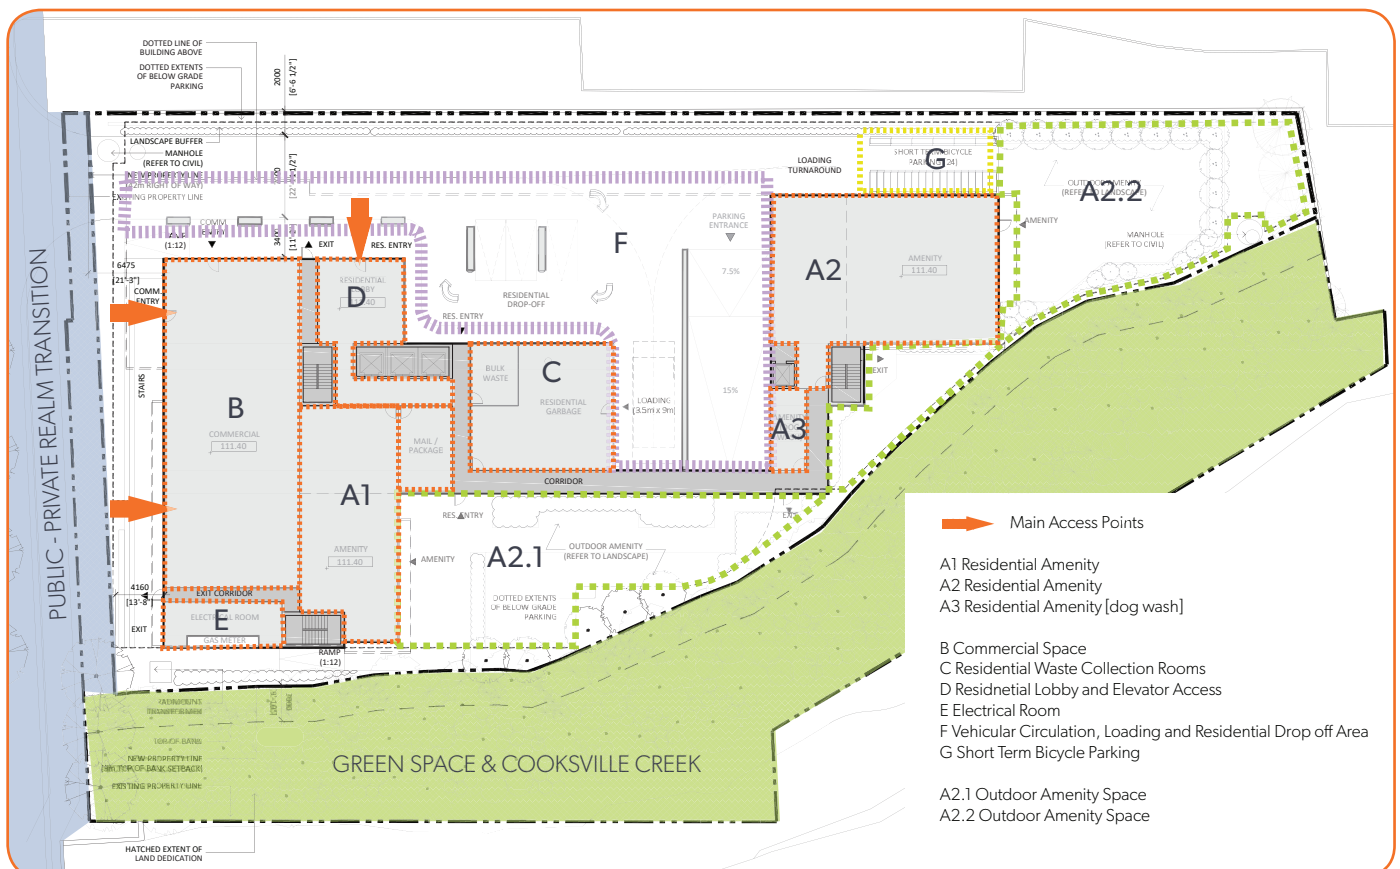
Site Organization Diagram: Site Plan Prepared by Studio JCI.
